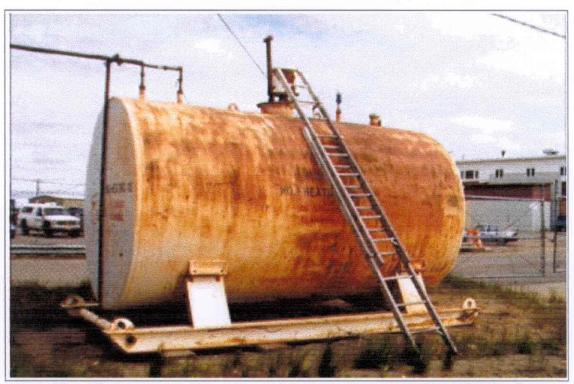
Rusted 1,500-gallon AST of no. 1 heating oil located by the fence line of the northeast side of the AAOF (facing northeast).
